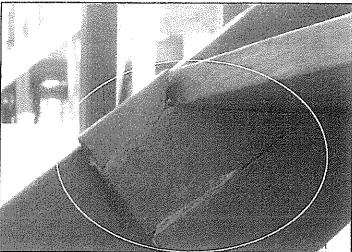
Facing west. Main wood column for elevated deck not plumb. Column is twisted.
